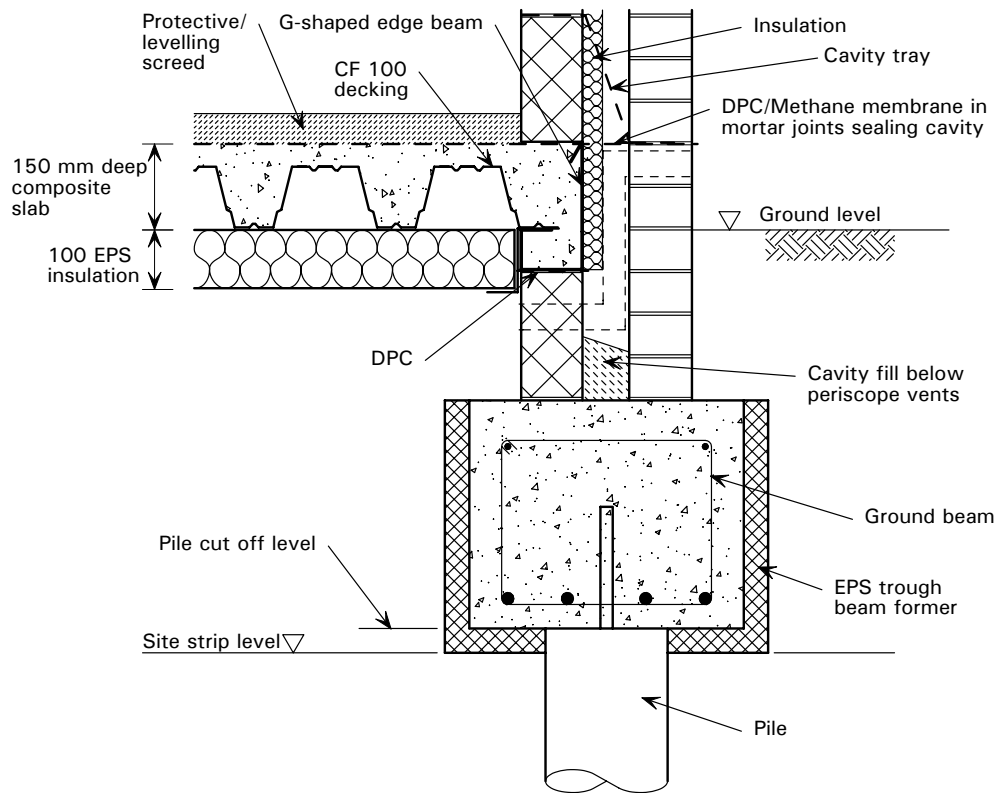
Piled composite ground floor with in-situ concrete ground beams
